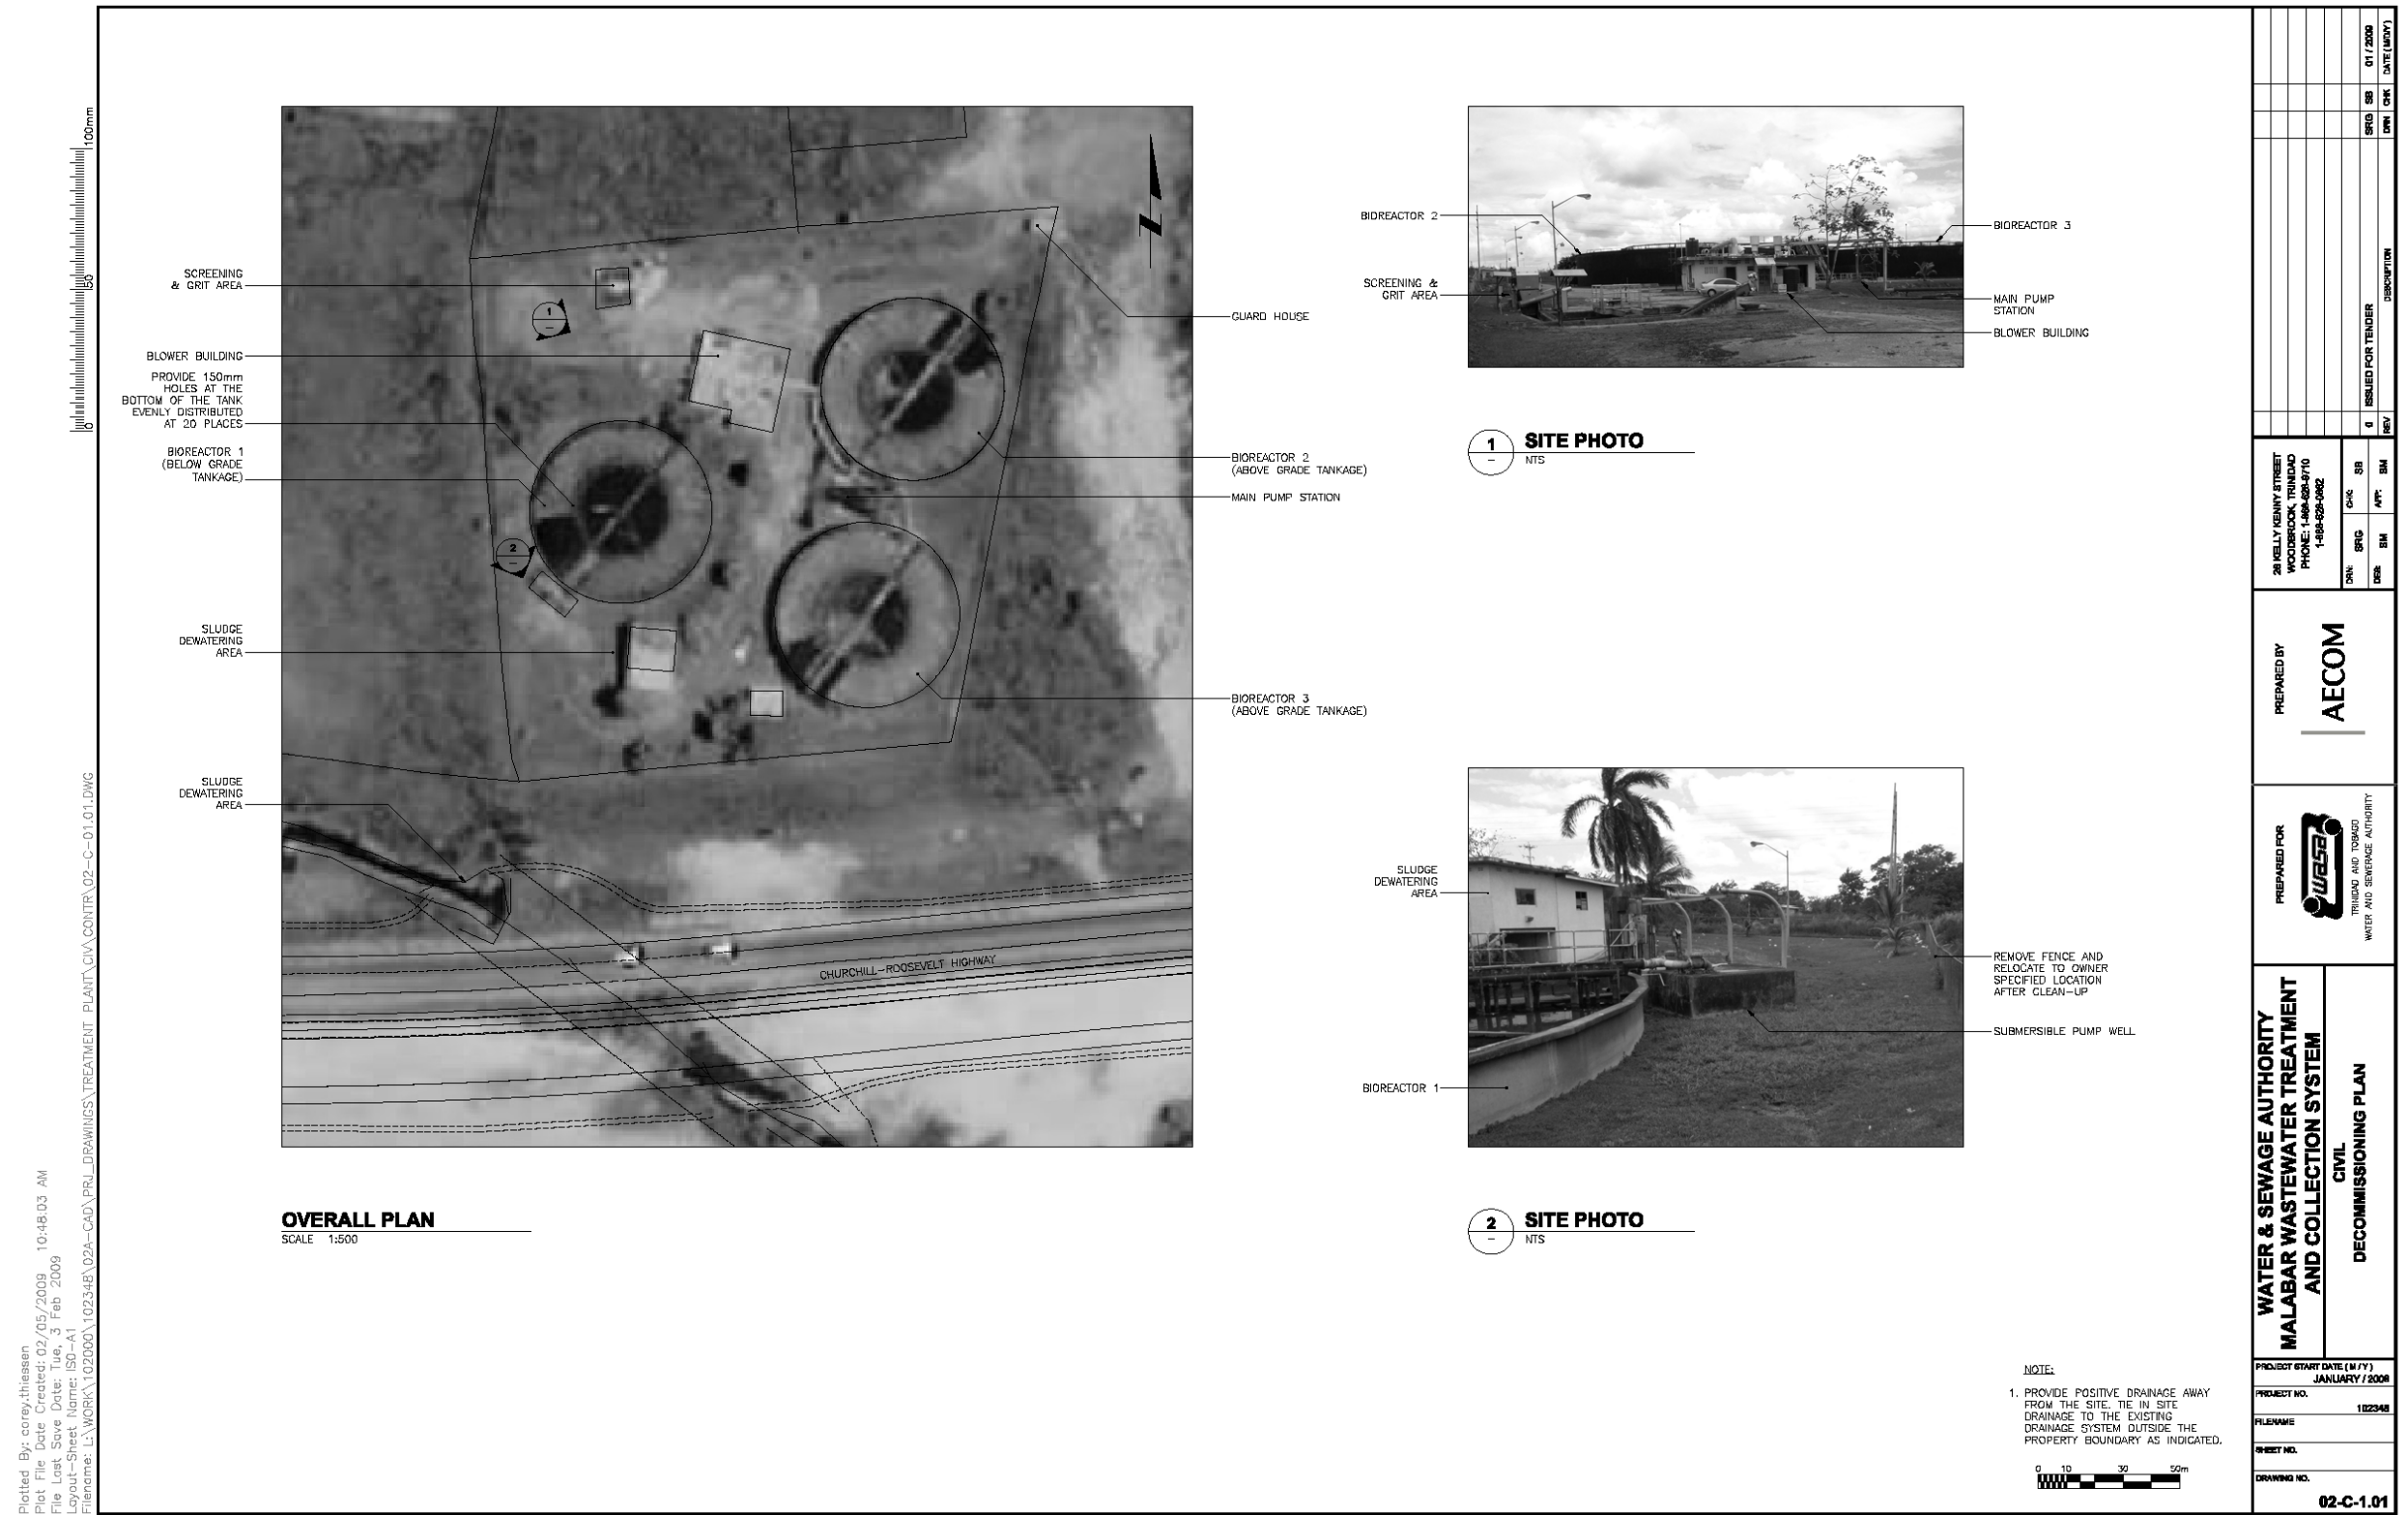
Existing Malabar WWTW Civil Decommissioning Plan
